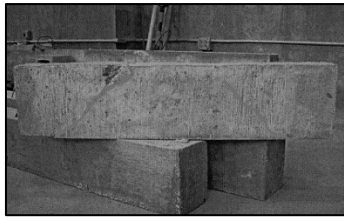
Plain Concrete Beams of dimension 500\*100\*100mm.
